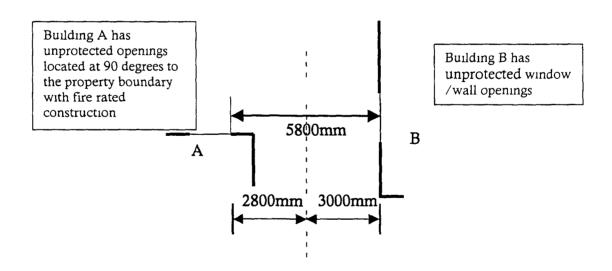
Plan view showing existing situation where non compliant openings of subject building (Building A) are located 2800mm from boundary and Building B set back 3000mm from property boundary
